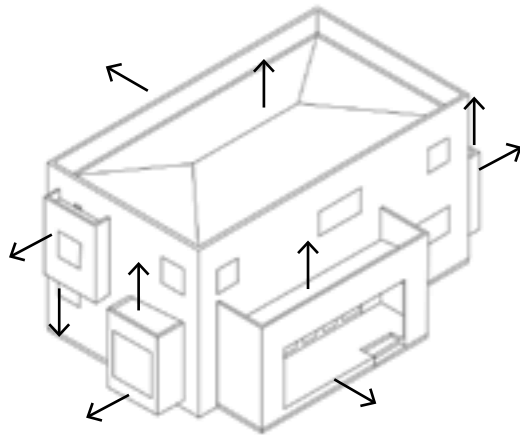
The flat roof and beam and column construction allows expansion in any direction outwards and upwards. The design can also be extended downward where the first floor links overhang.
